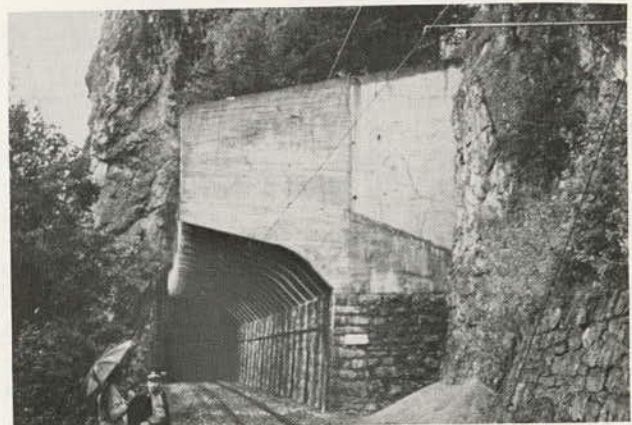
Tunnel in steep terrain with extended portal shedlike structure to protect Canadian National Railway line from rock falls generated in a slide area (note use of retaining walls of rock blocks below track).
